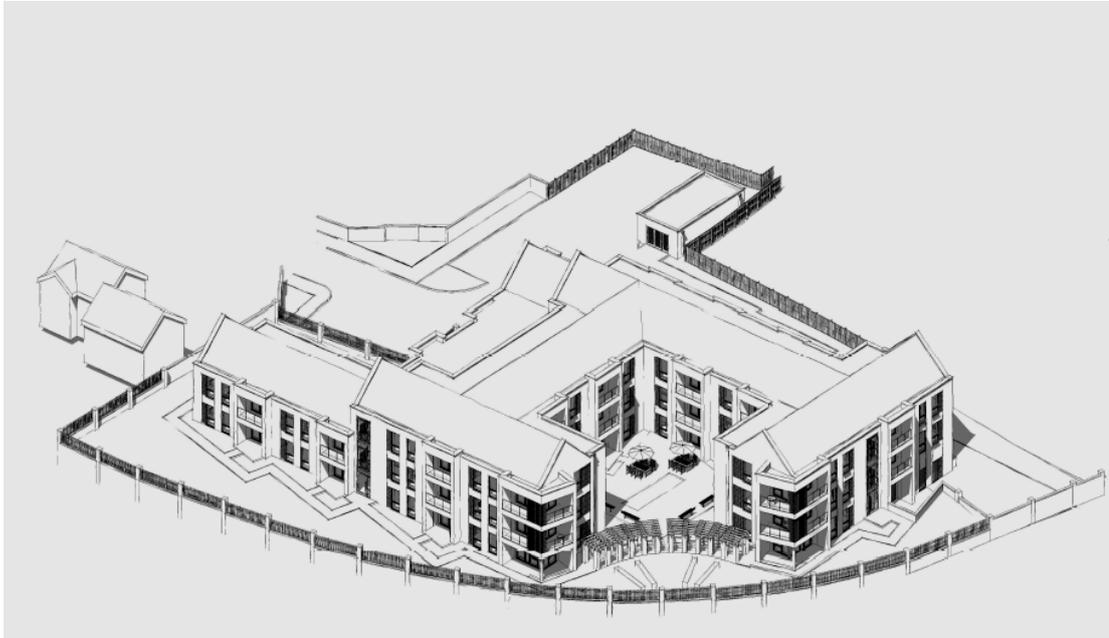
3D drawing viewed from Kingsnorth Road/Beaver Lane junction
